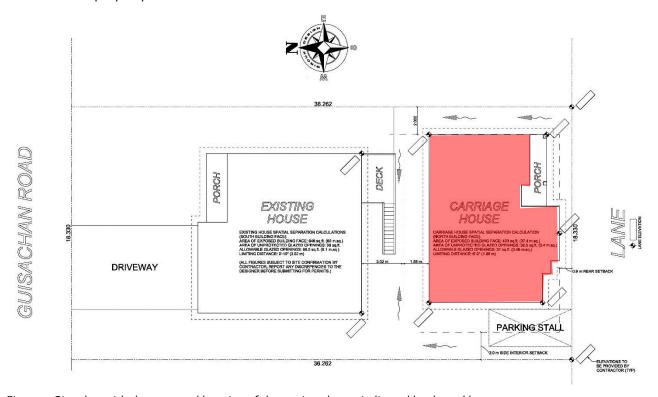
Site plan with the proposed location of the carriage house indicated by the red box.
